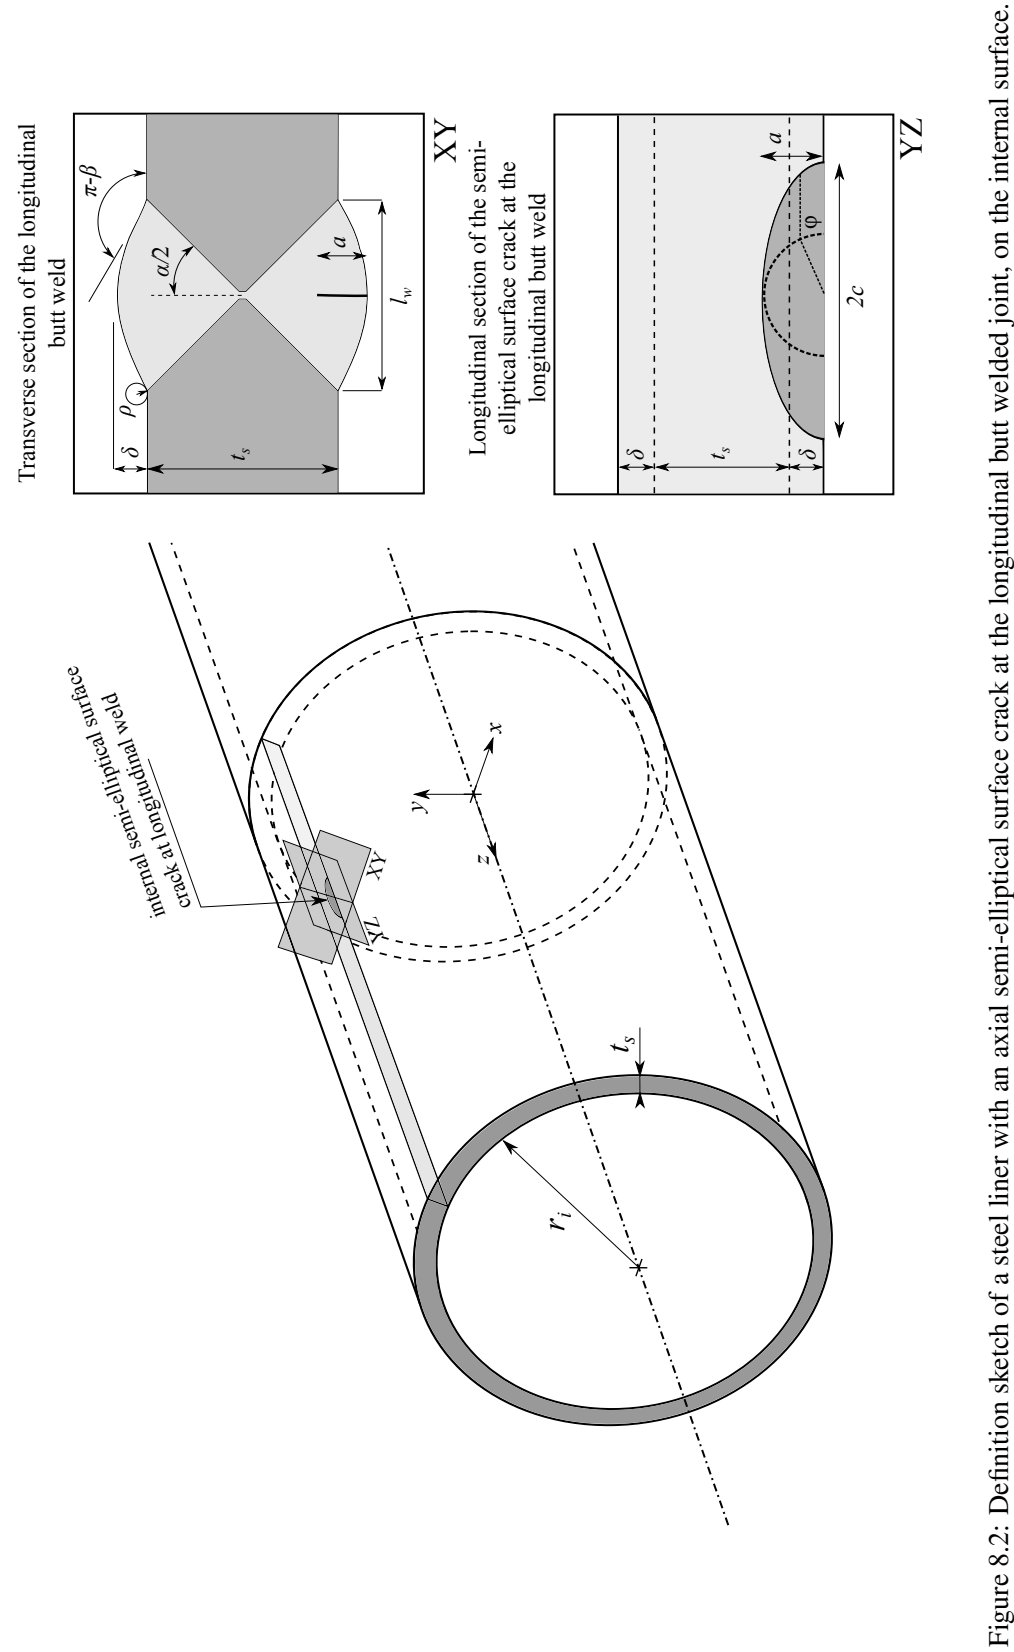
Definition sketch of a steel liner with an axial semi-elliptical surface crack at the longitudinal butt welded joint, on the internal surface.
